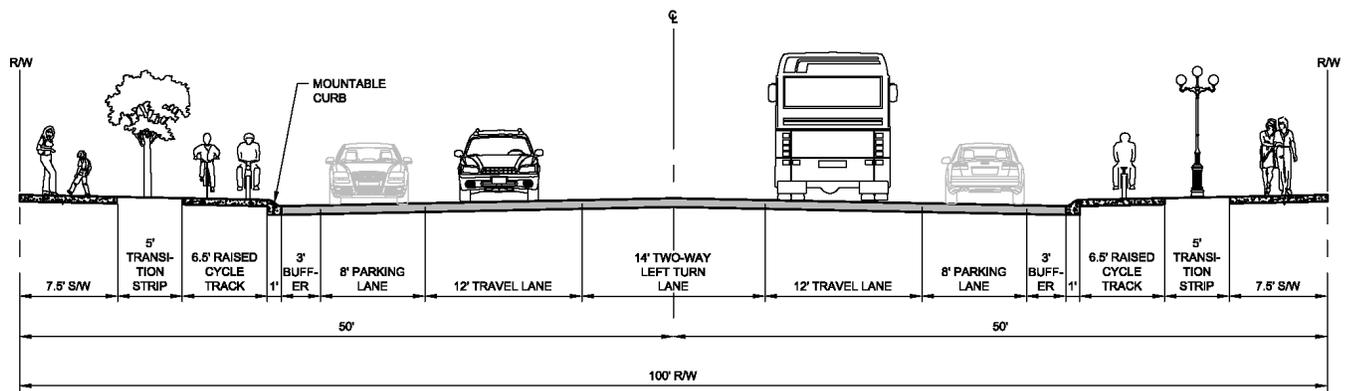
Typical Section of Major Avenue, with Raised Cycle Tracks
